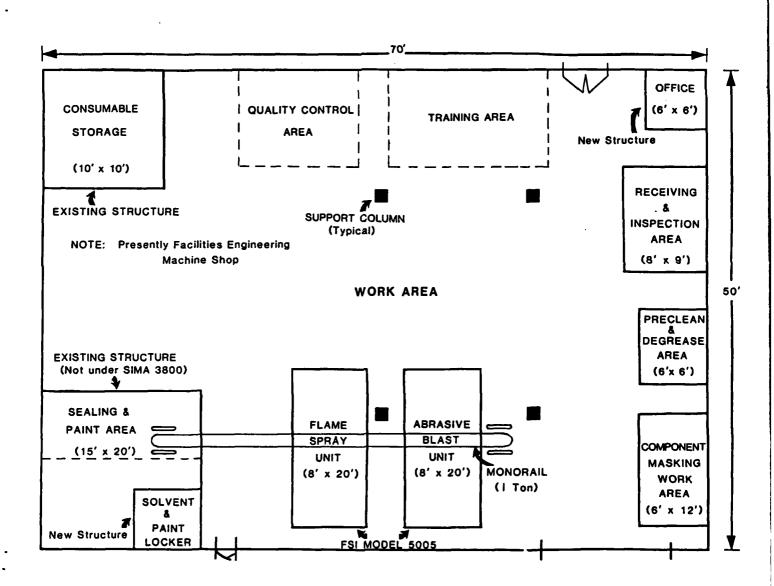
PILOT CC SHOP LAYOUT - BLDG. 20
